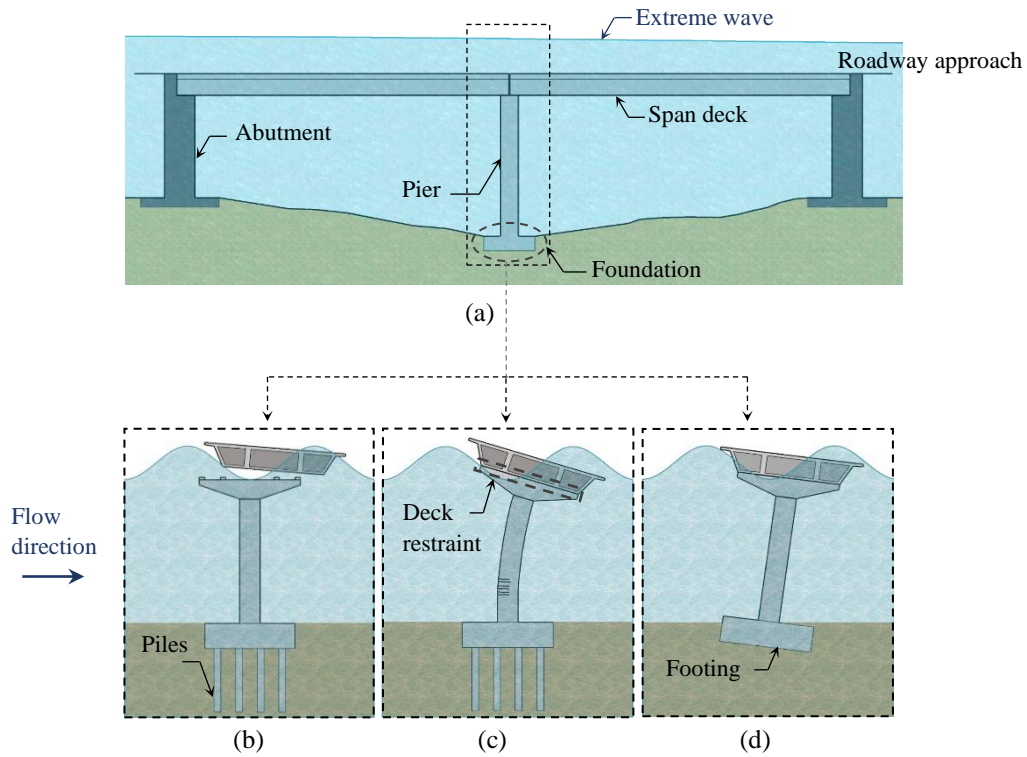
Illustrative diagram of potential damage in bridges subjected to extreme wave-induced forces: (a) bridge main components; (b) unseating of simply supported decks; (c) significant lateral displacements of piers in bridges with a strong deck-substructure connection; and (d) uplifting and lateral displacement of foundation.
